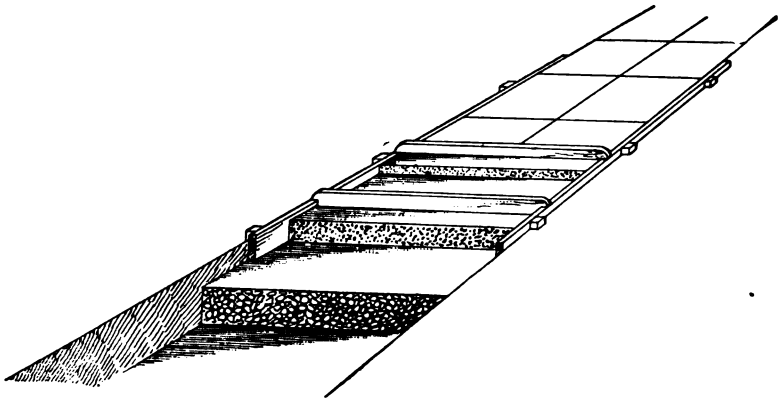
Sketch Showing Sidewalk Construction of Concrete.
